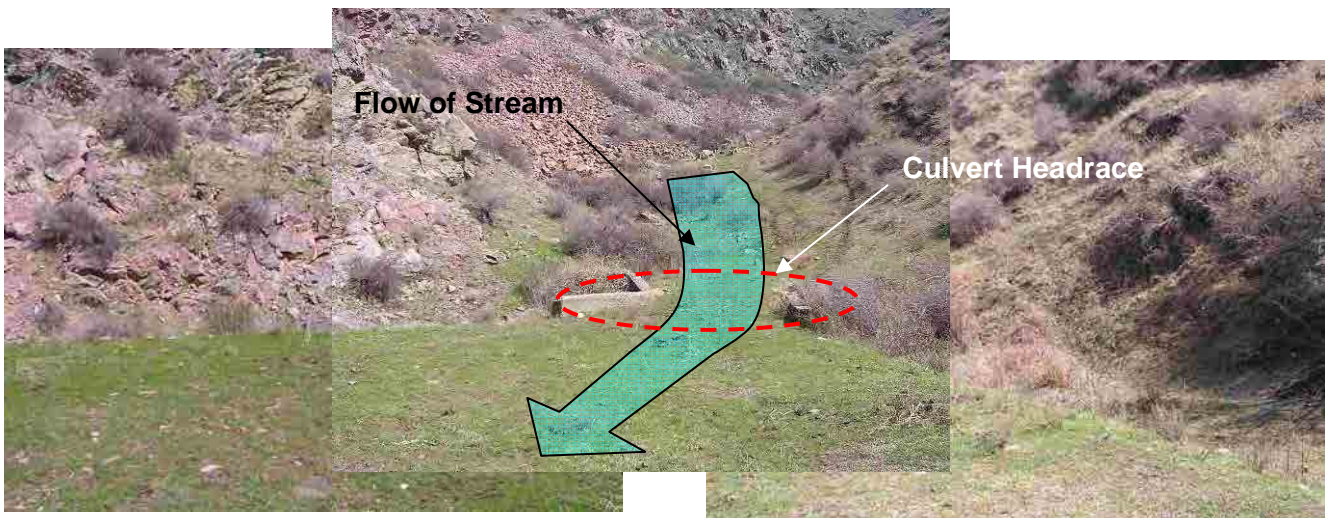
Stream Crossing Point (Culvert channel) (840 m upstream of head tank)
